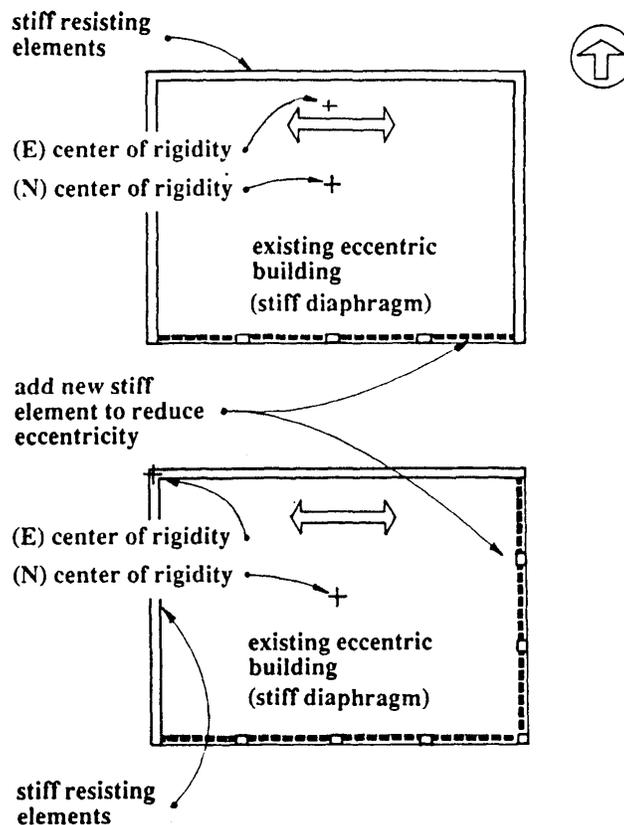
Horizontal or Plan Irregularities -- Rehabilitating a Structure to Reduce Torsion Loads
